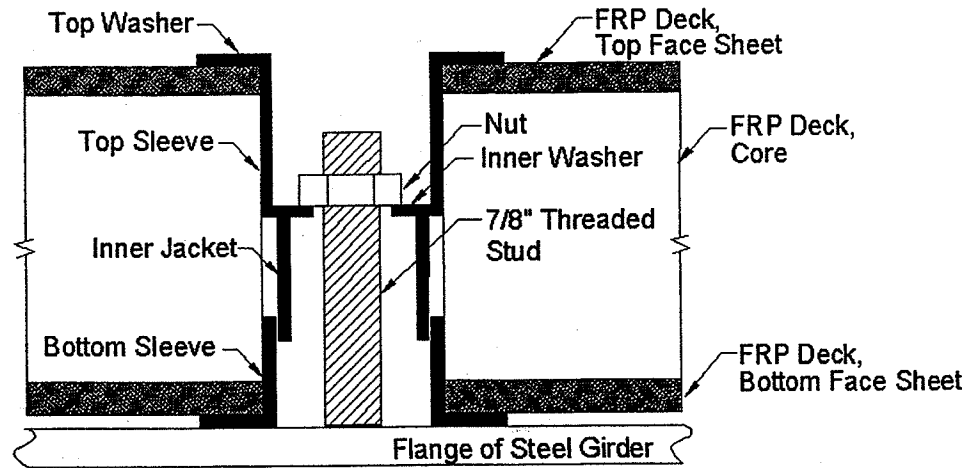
Panel Connected to Girder with Type 1 Connection
